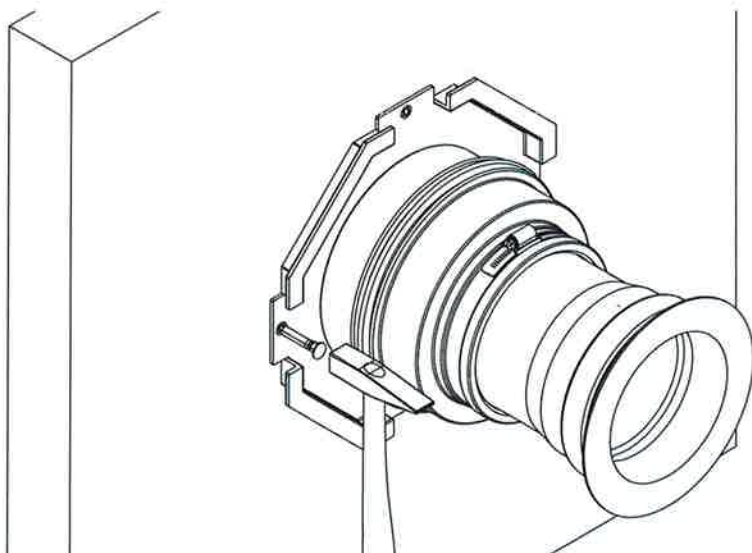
Nailing the universal wall entry on the bottom of the wooden frame (manufacturer's drawing).
